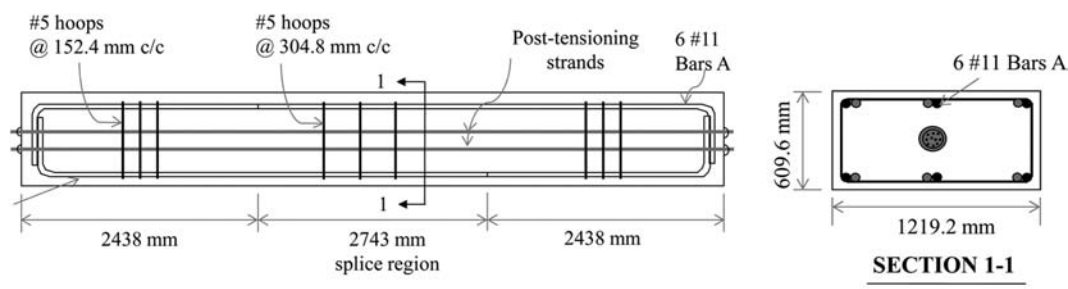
Dimensions and reinforcement layout of large-scale column specimens.
